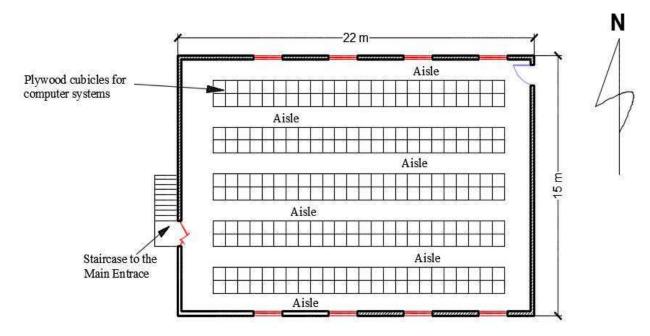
Typical Layout Plan of the Existing Building and Control Buildings
